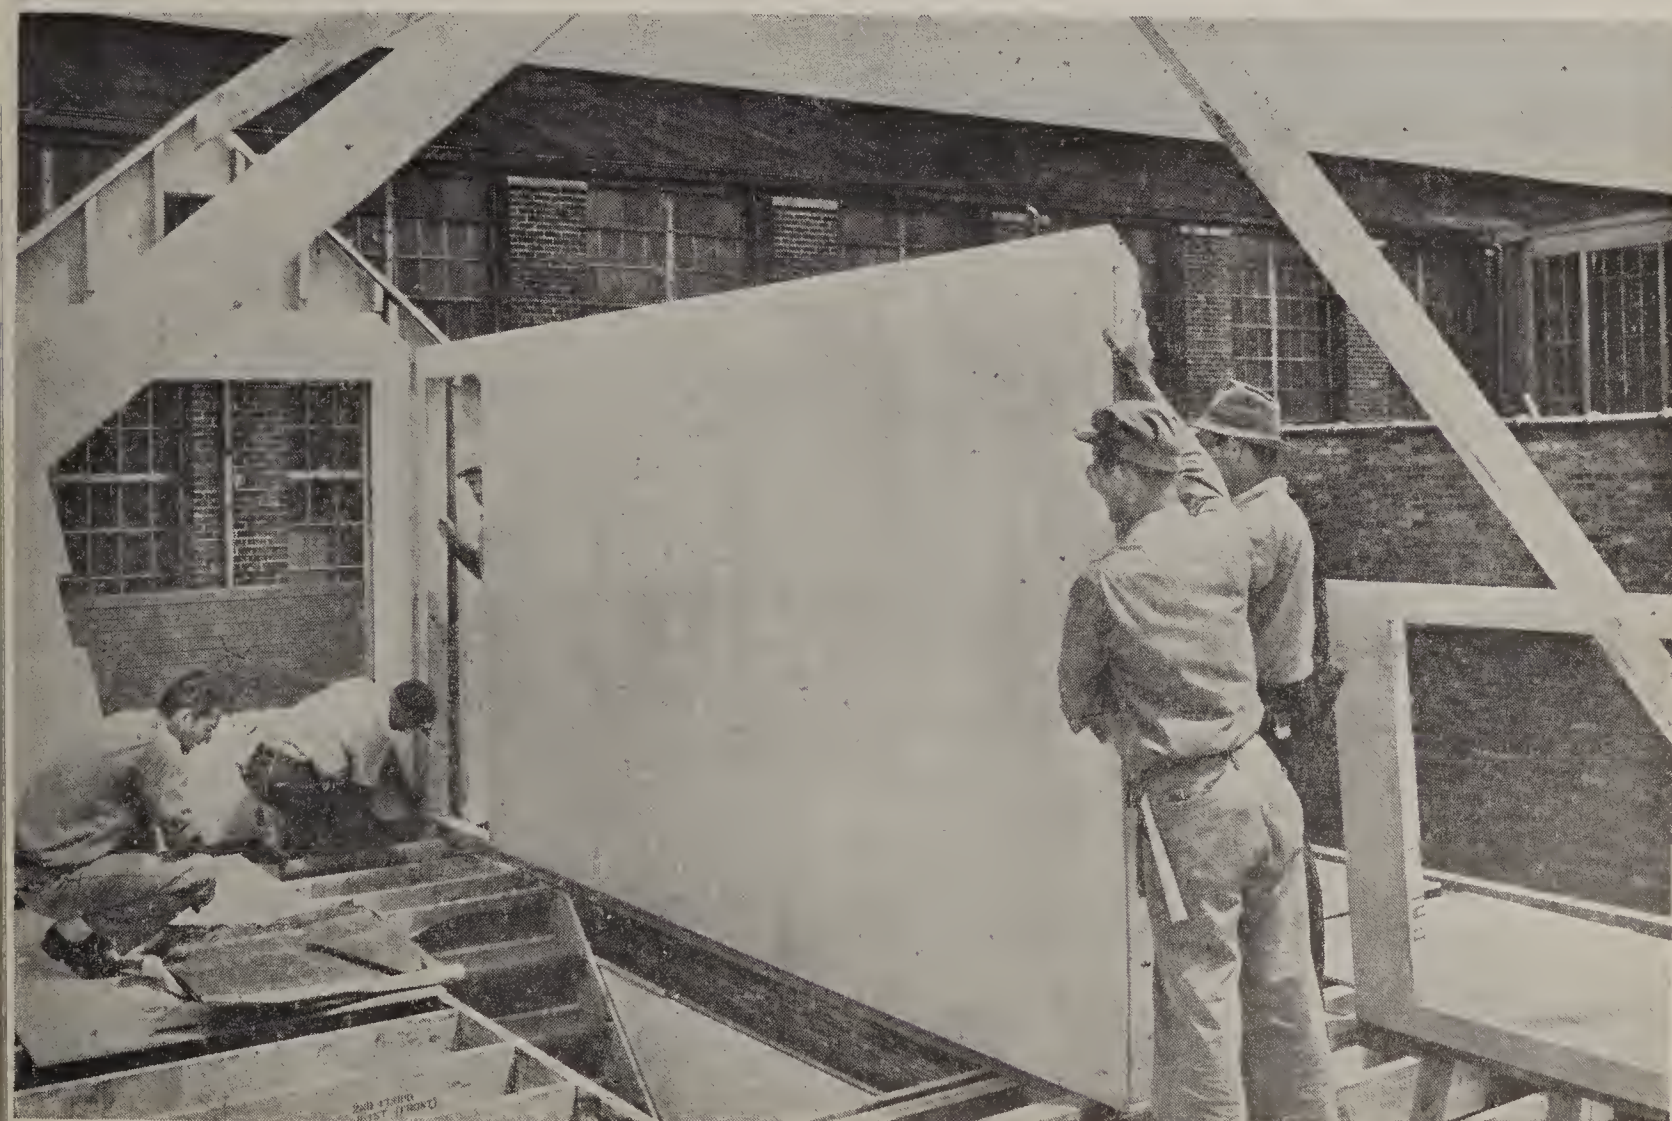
Installing panel in second story of pitched-roof house.
